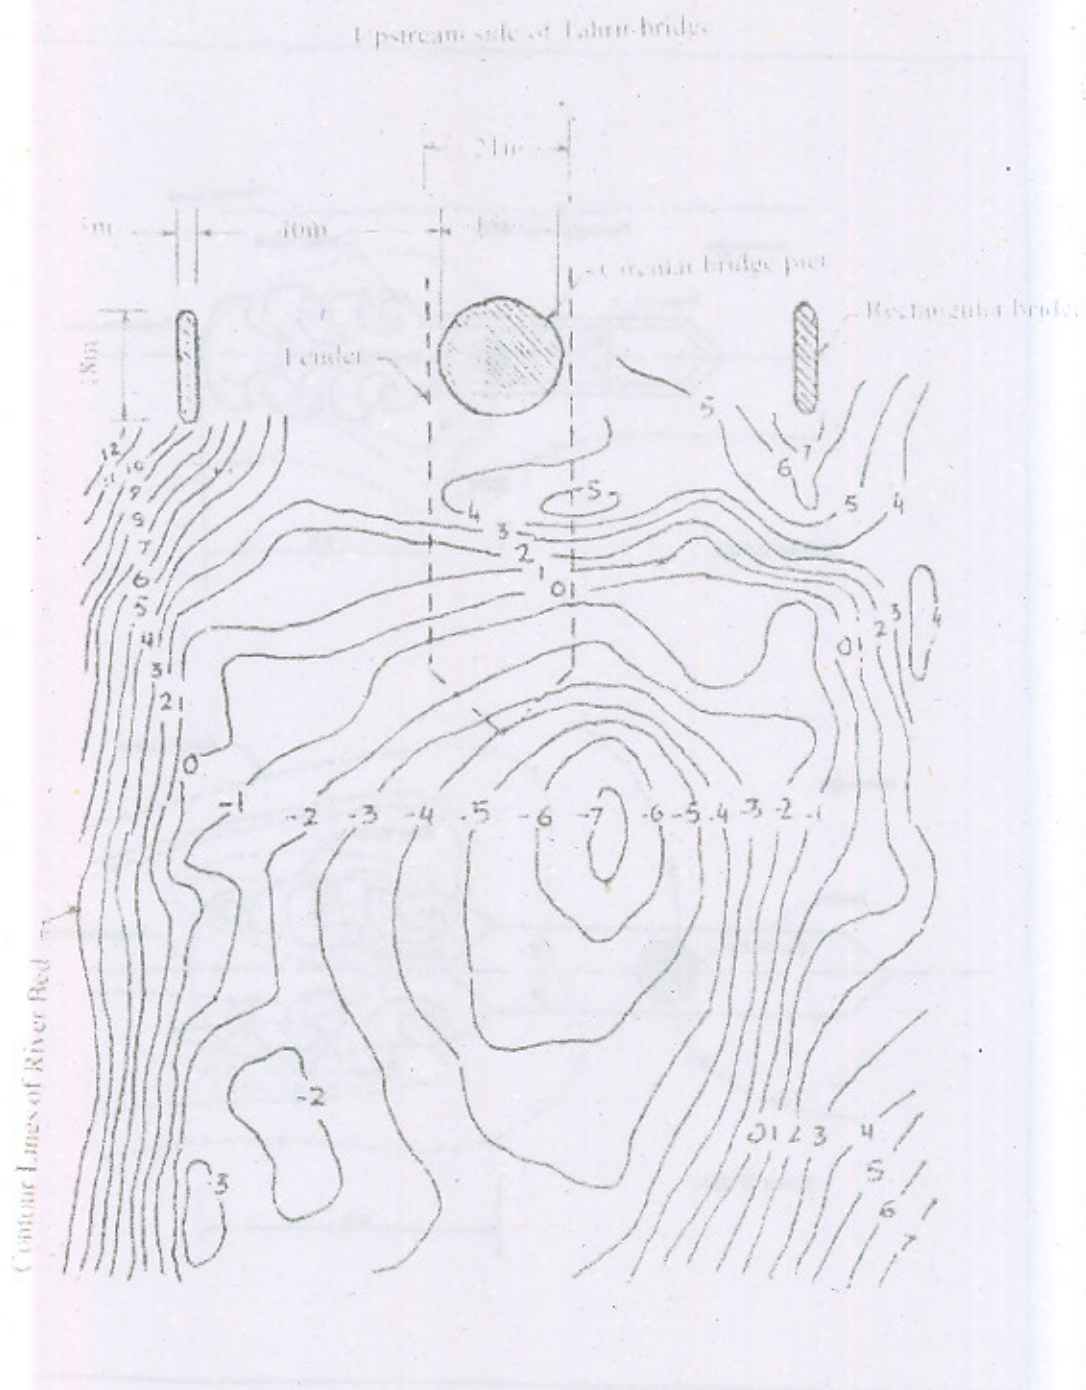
Part plan of Tahrir Bridge Showing Circular Pier Details
